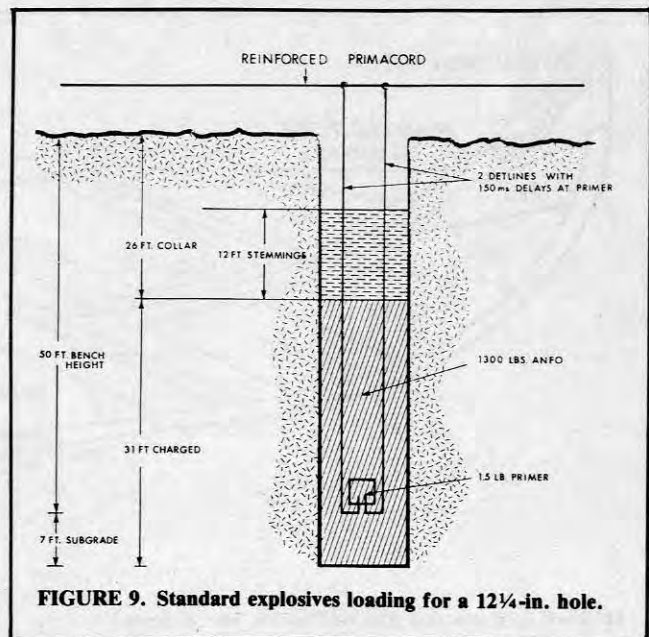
Standard explosives loading for a 1 1/4-in. hole.
